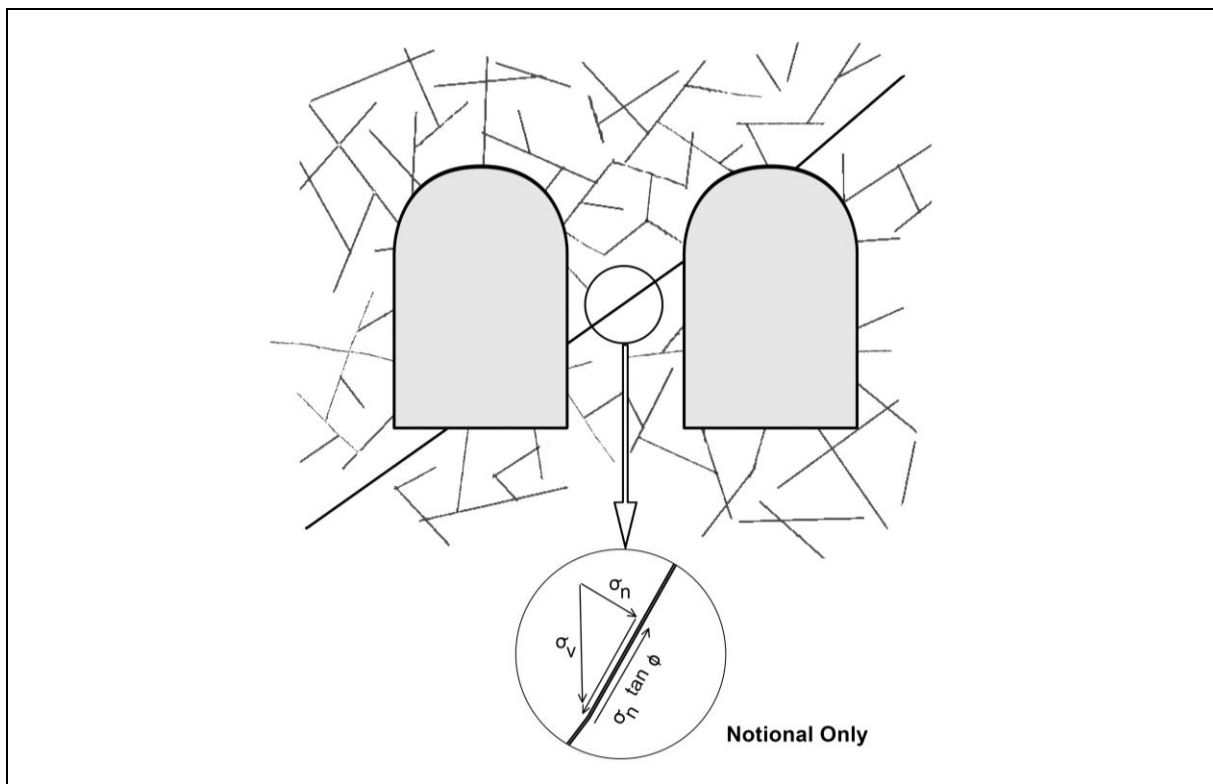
Stability of Pillars with Potential Sliding Planes
